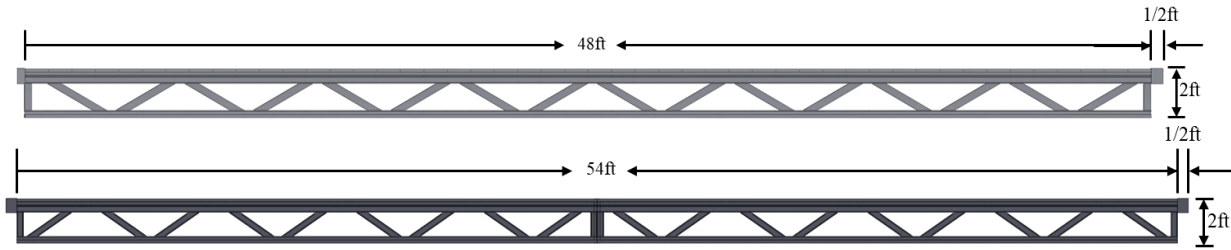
Profile of the Long-Span Trusses Tested at UNT
